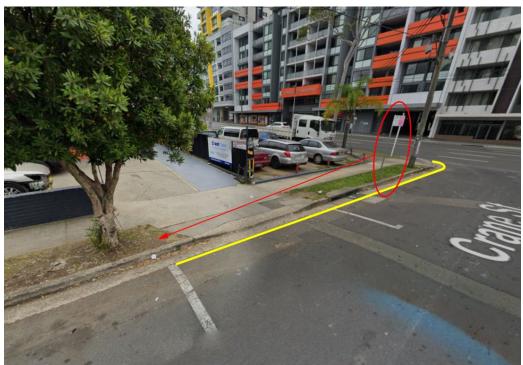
proposed sign relocation and line marking on Crane Street near Parramatta Road
